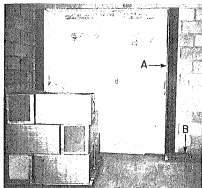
Damage to door of cooler and wall minimized by (A) steel angle framing and (B) bumper rail.
